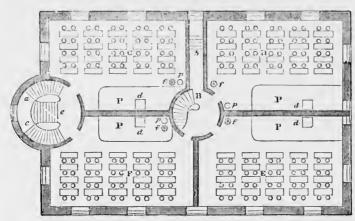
Plan of the Ground Floor, adapted to Fig. 154.
